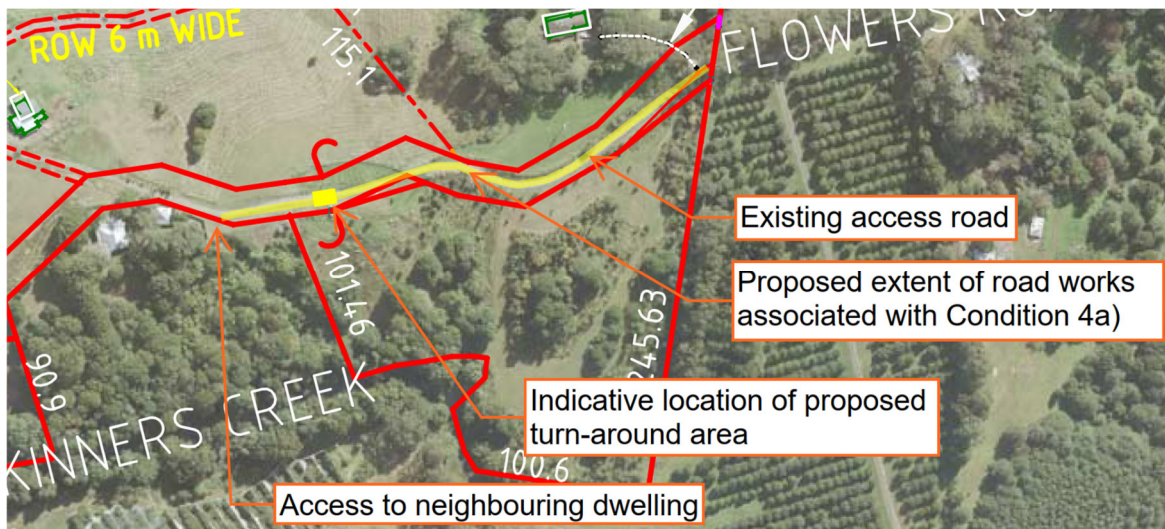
Excerpt of approved subdivision plan with mark-ups in orange
